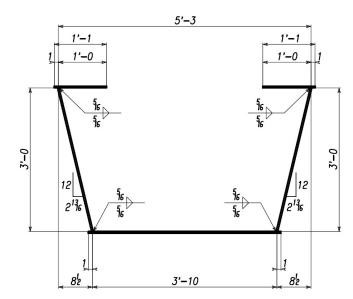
Full-Scale Offset Top Flange Tub Girder Specimen - Cross Section
